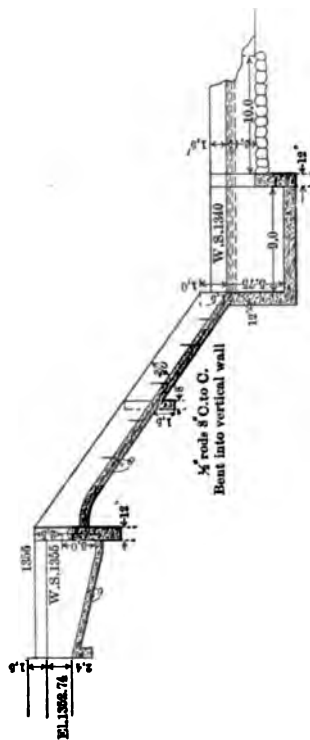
Reinforced Concrete Rapid, Okanogan Project, Washington.
